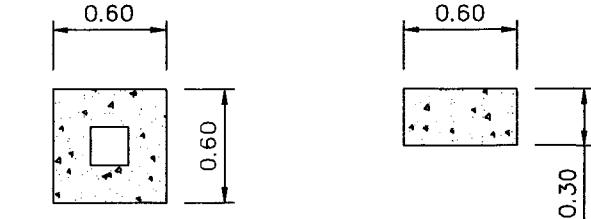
DETAIL CONCRETE POLE NO.5,12 (FRONT VIEW)
